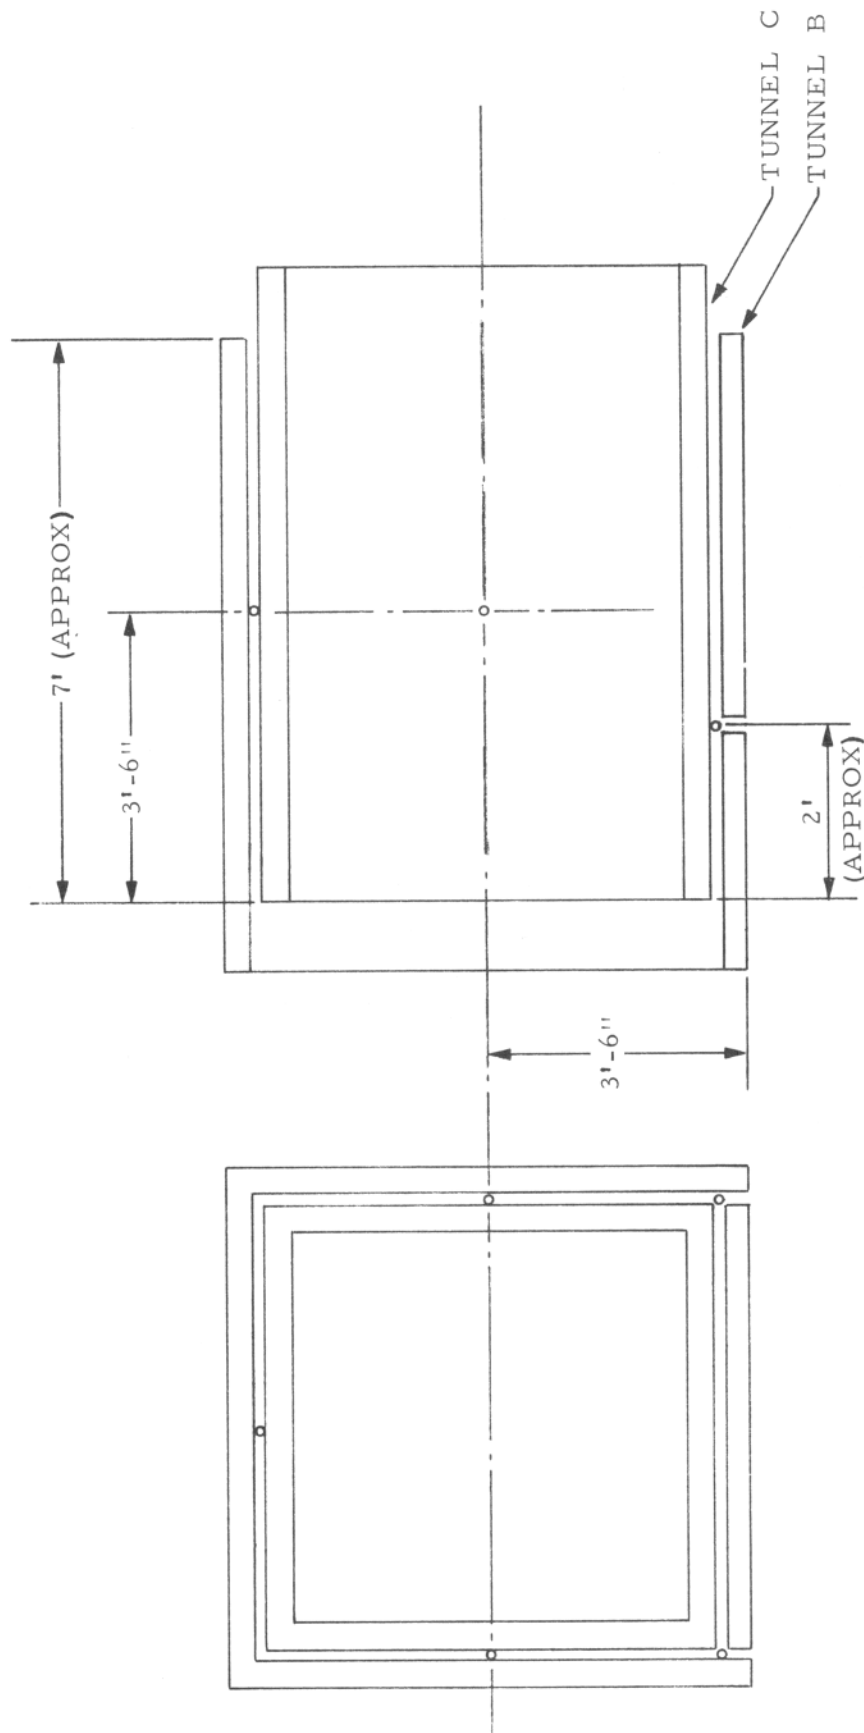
AIRCRAFT LOADING WALKWAY THERMOCOUPLE POSITIONS WITHIN THE OVERLAPPING SECTION BETWEEN TUNNELS B AND C
